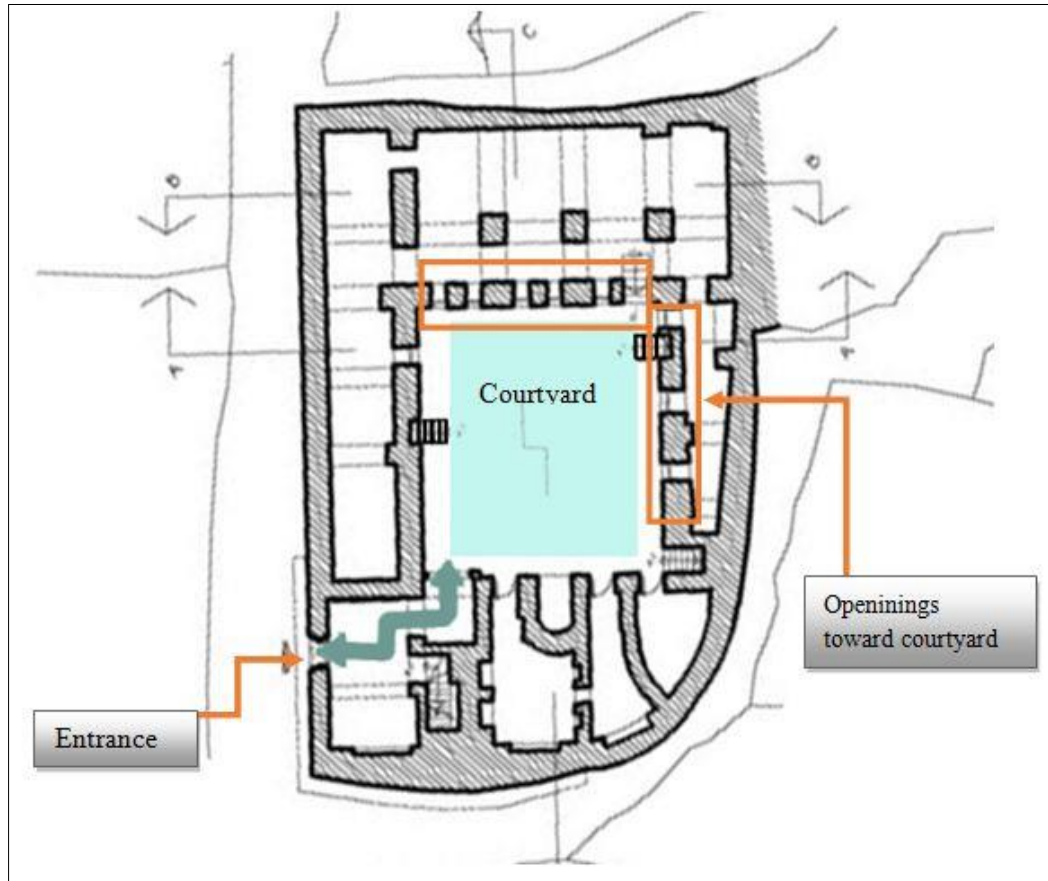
Selected house drawing by HECER in Erbil citadel (Fattah Chalabi house), ground floor plan, details by author
